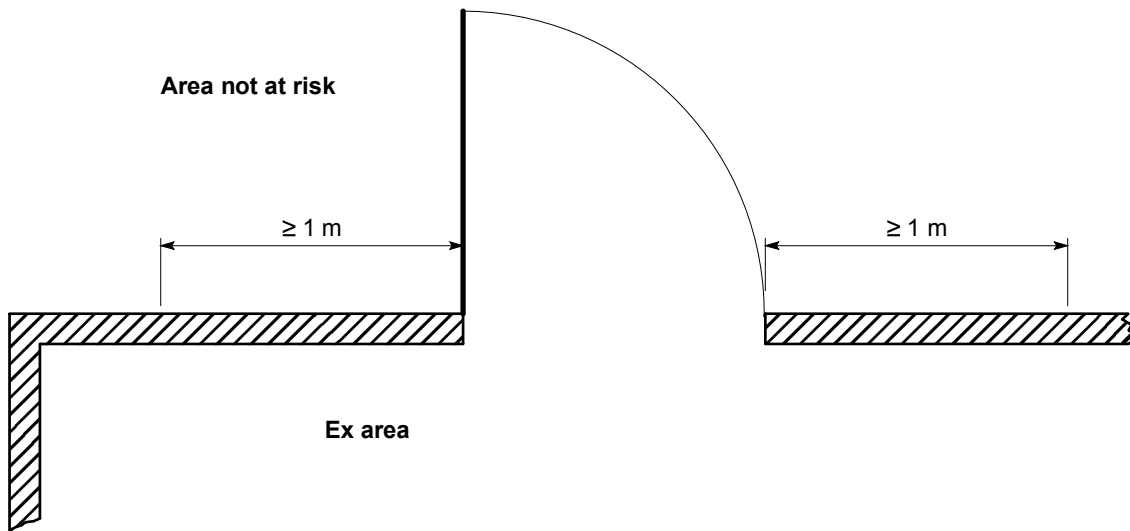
Minimum spacing between doors/openings to ex-rooms for apparatus in area not at risk
